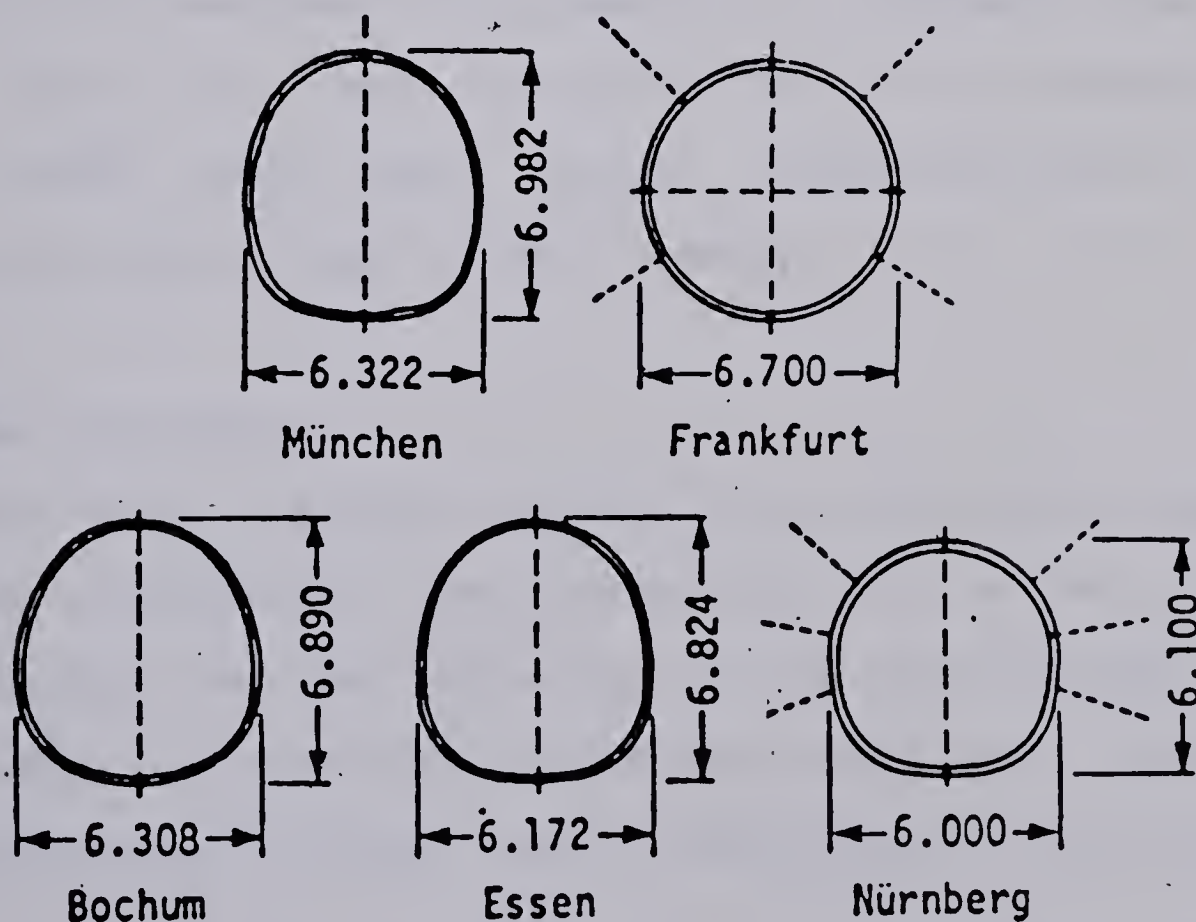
Typical cross-section shapes that have been used in West German cities (after Braun, 1982:modified)
